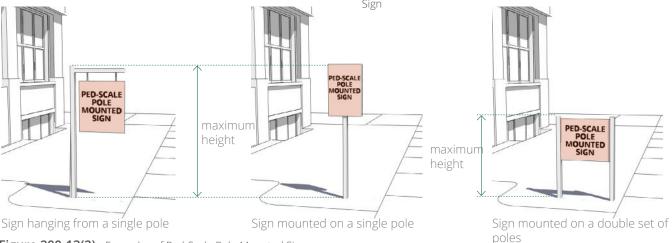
(2). Examples of Ped-Scale Pole-Mounted Signs
